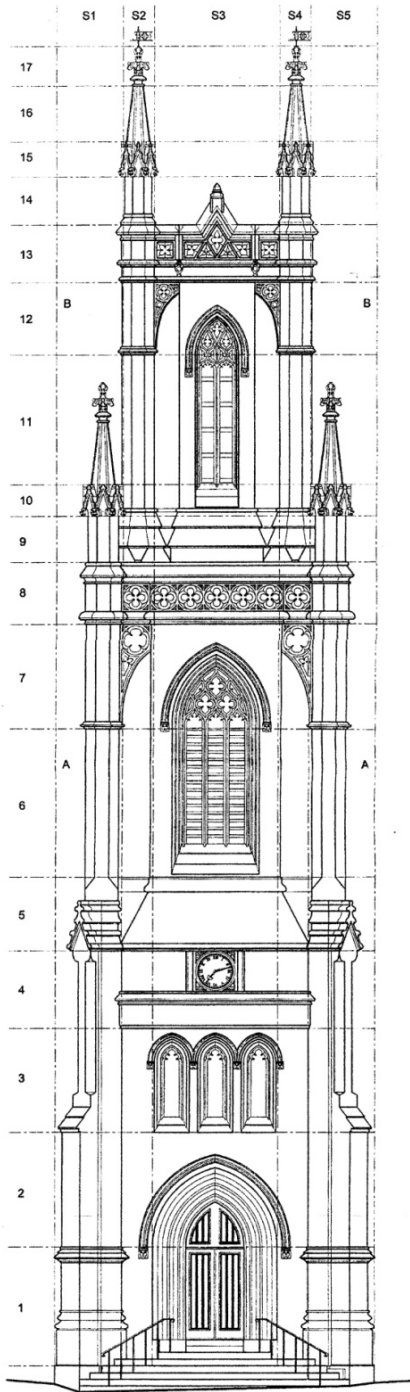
Elevation drawing of St Stephens Church, Bath. Sample point #2 is in zone 13 and sample point #7 is in zone 1.
